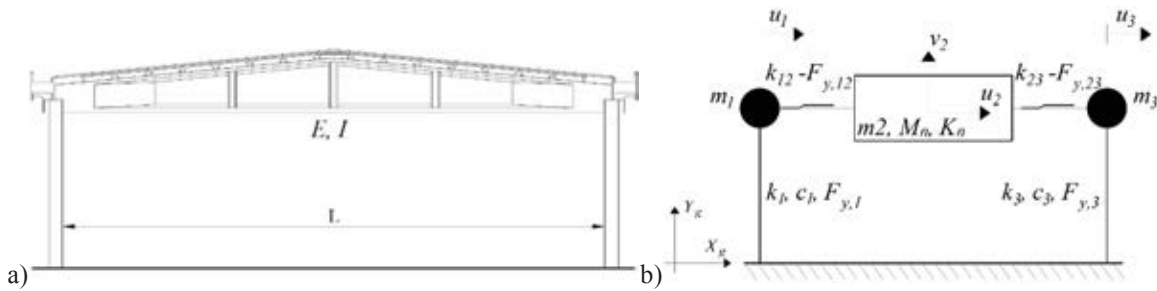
a) layout of a typical portal-like precast industrial building; b) simplified 3DOF system adopted.
